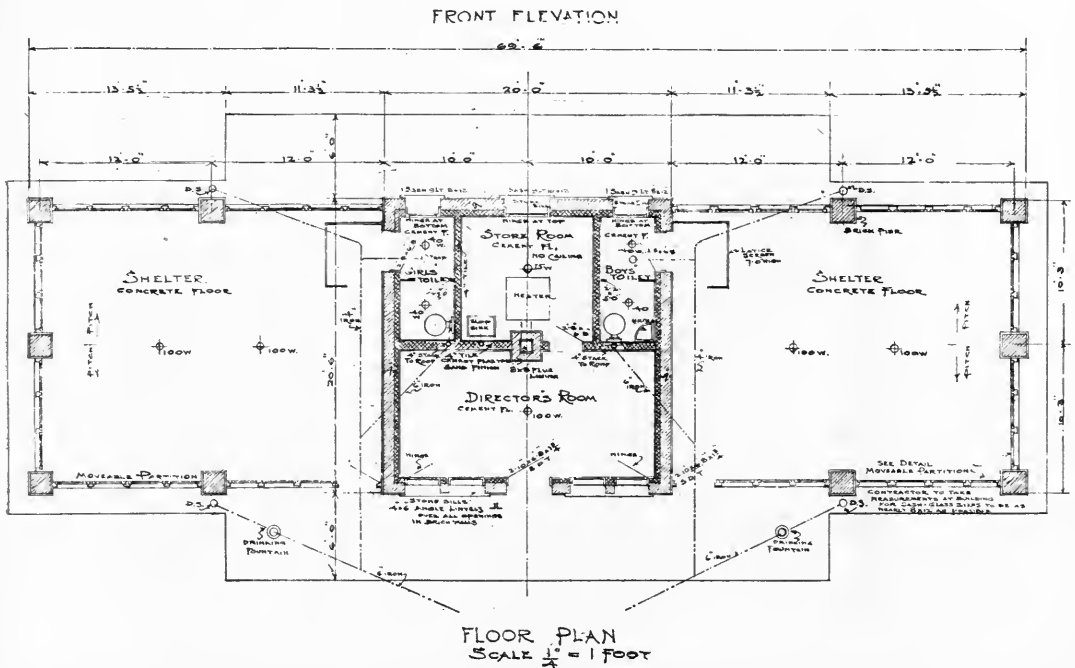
FLOOR PLAN OF EVANSTON SHELTER HOUSE
